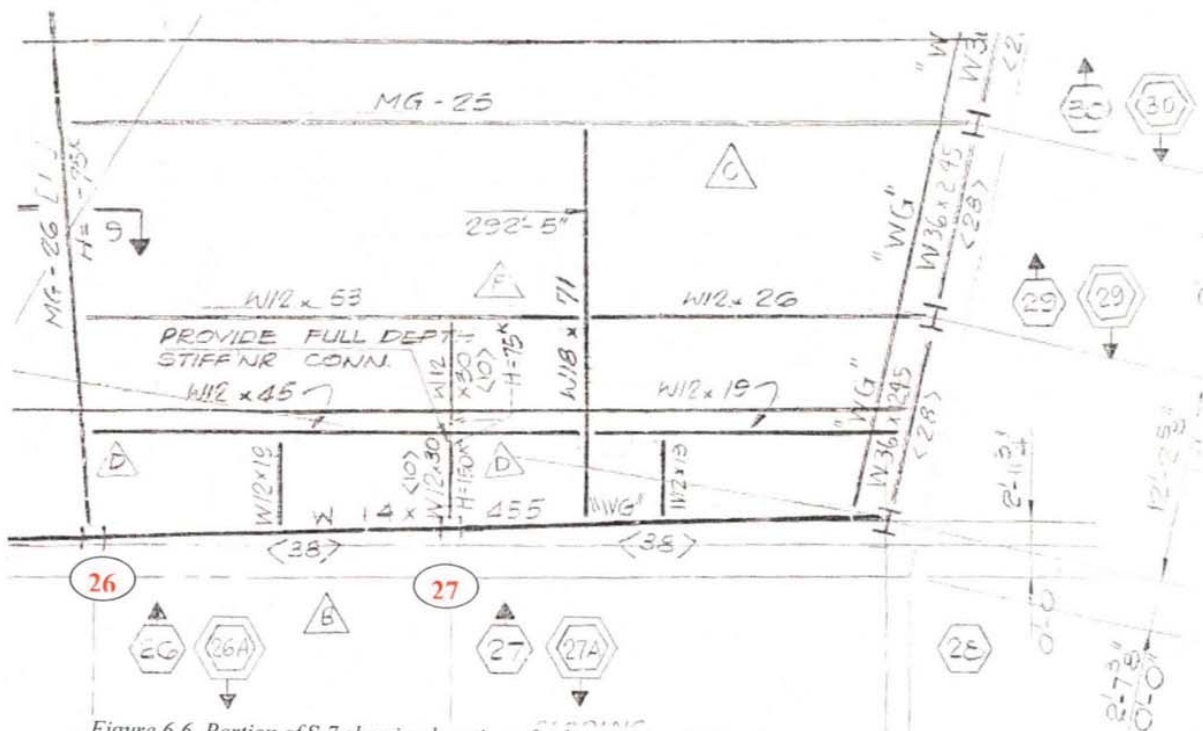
Portion of S-7 showing location of columns 26 and 27 in the southeast corner
